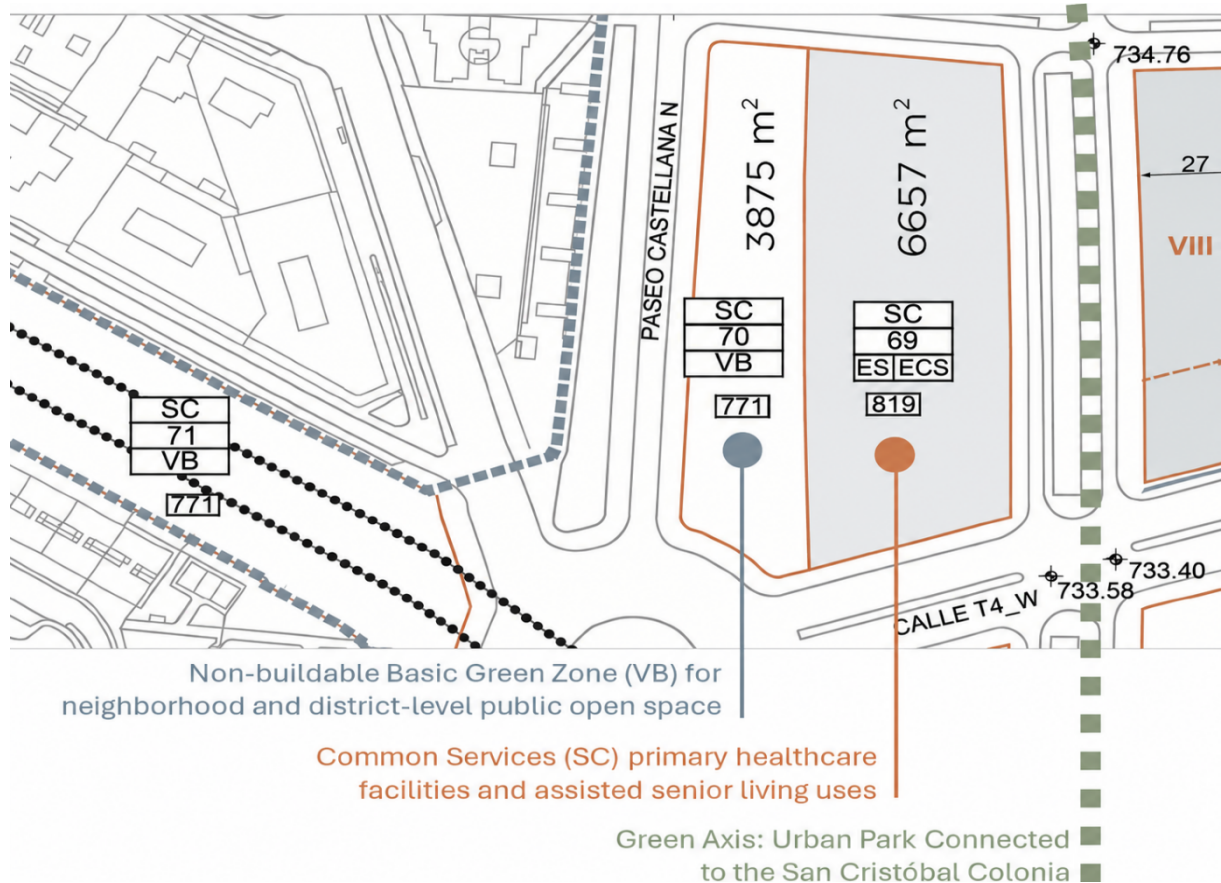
Urban plan for the new construction site with Plots 69 and 70
